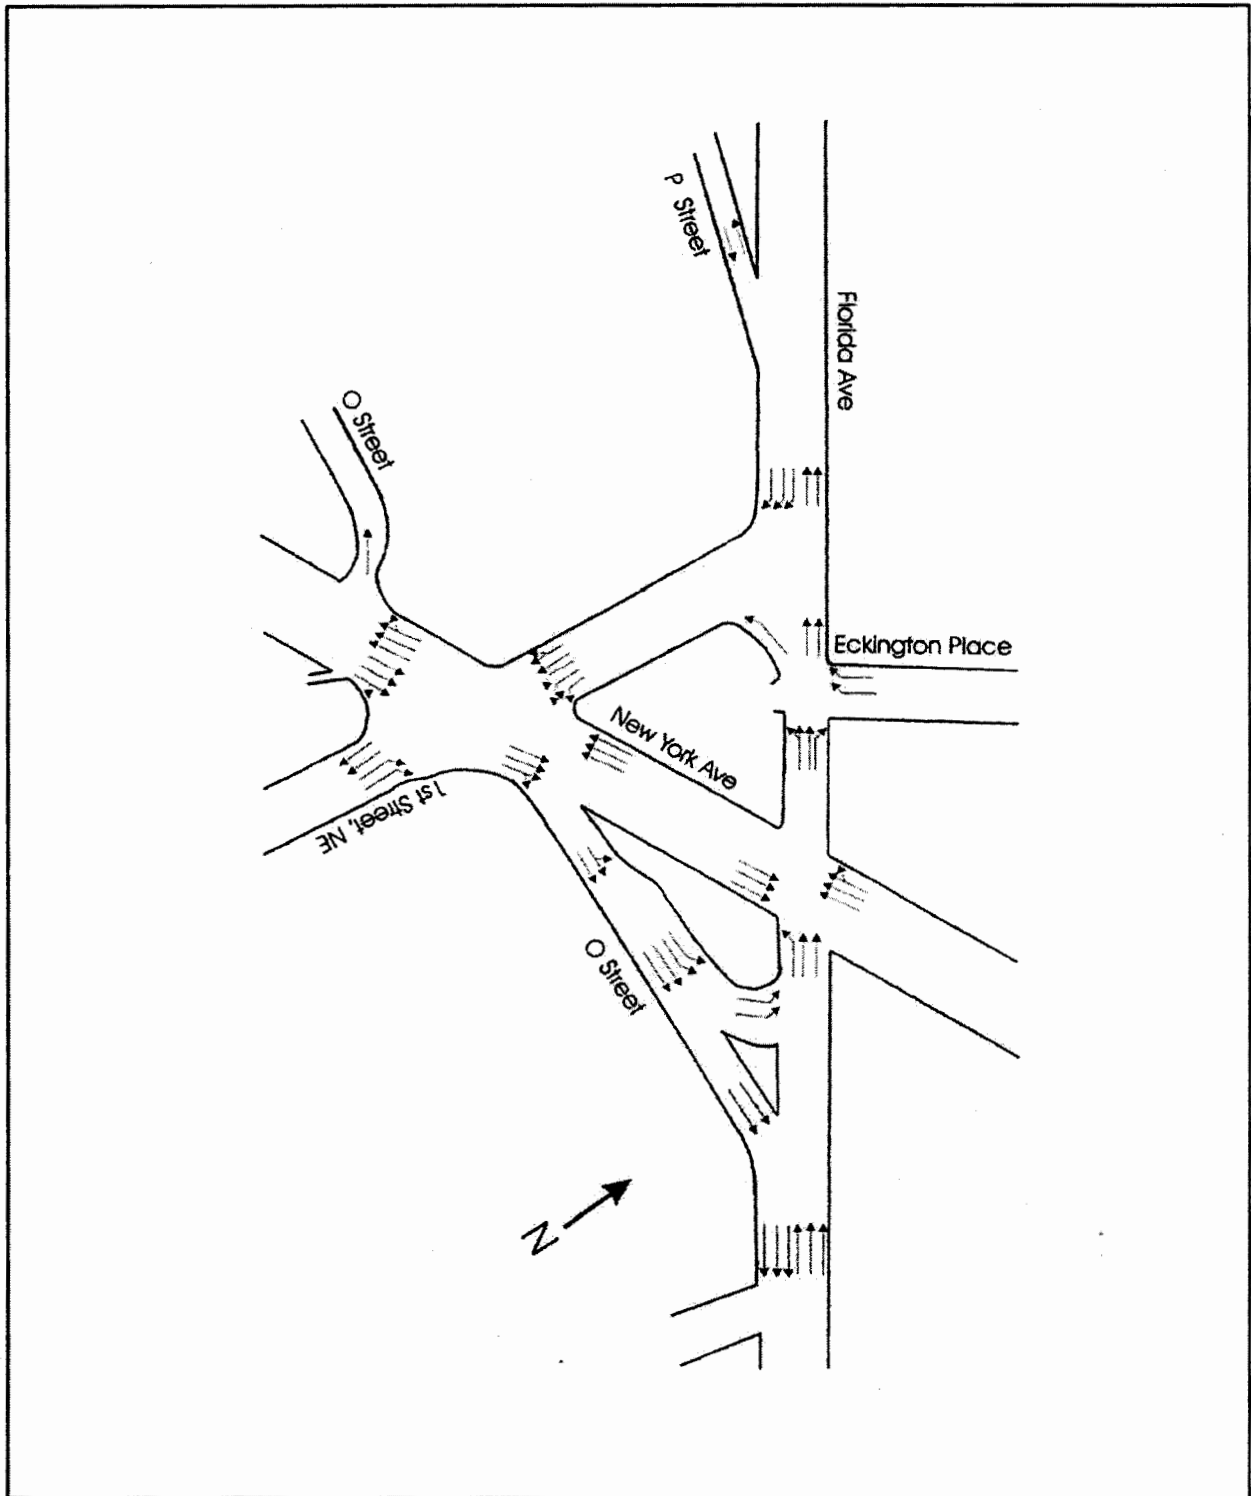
Interim Improvements to New York Avenue/Florida Avenue Intersection
